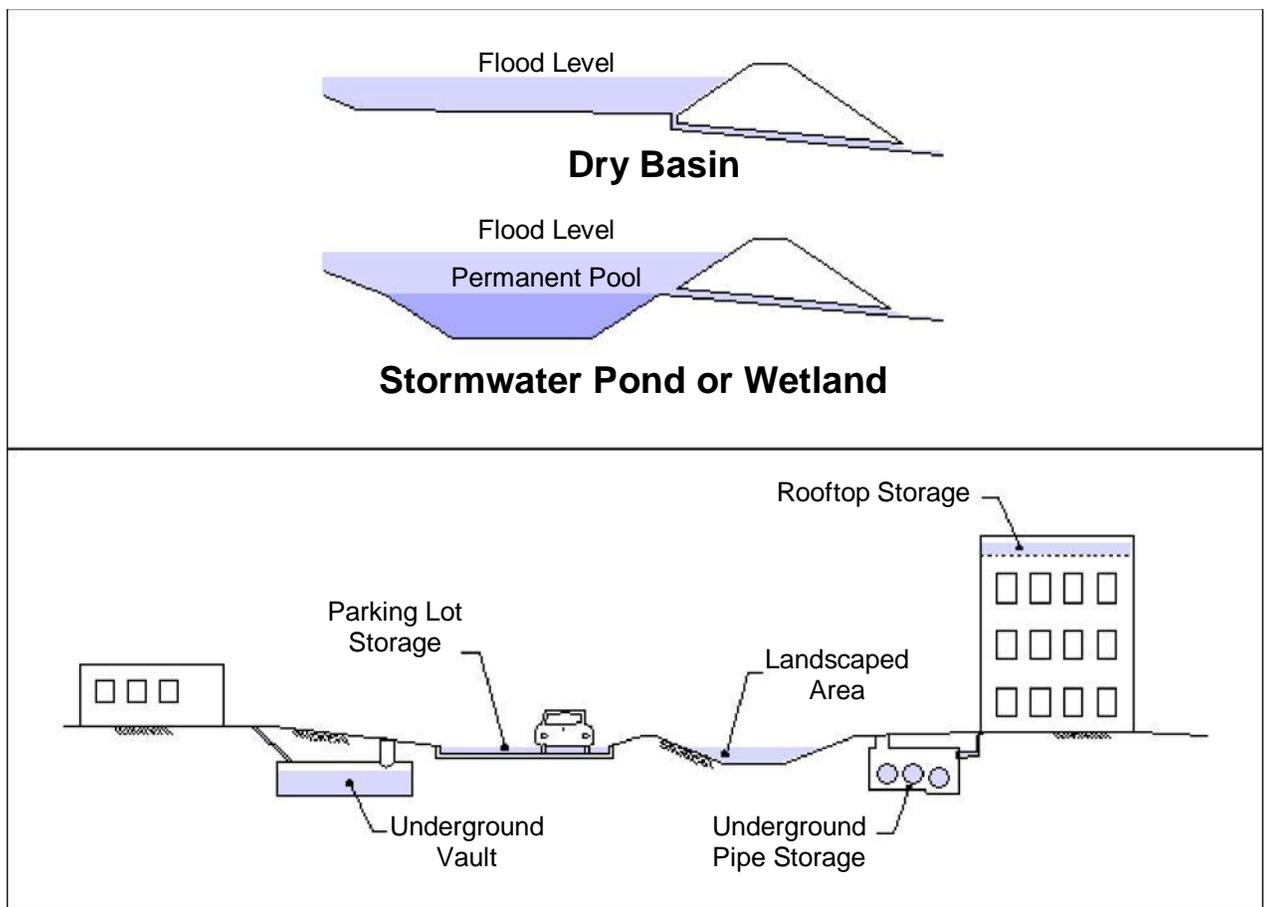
Examples of Typical Stormwater Storage Facilities
